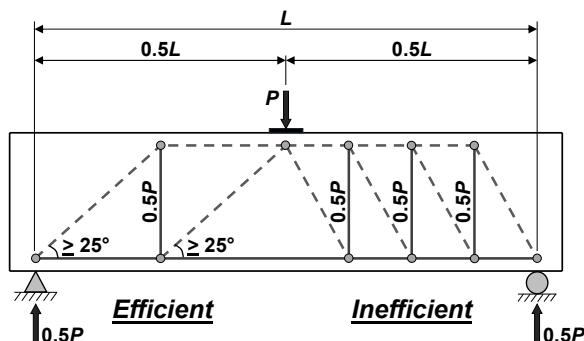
Effect of Modeling on the Amount of Transverse Reinforcement
